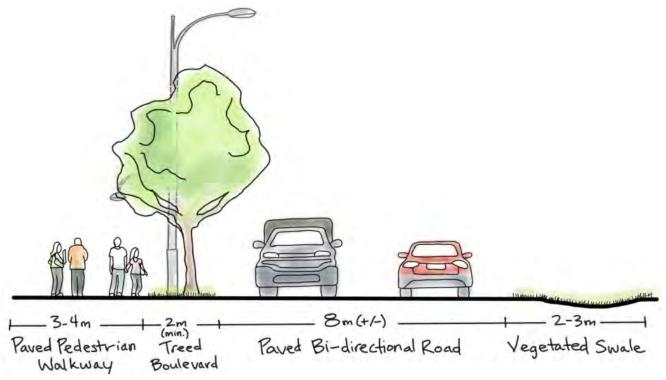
Main Spine Road – Proposed Cross Section (typical)
